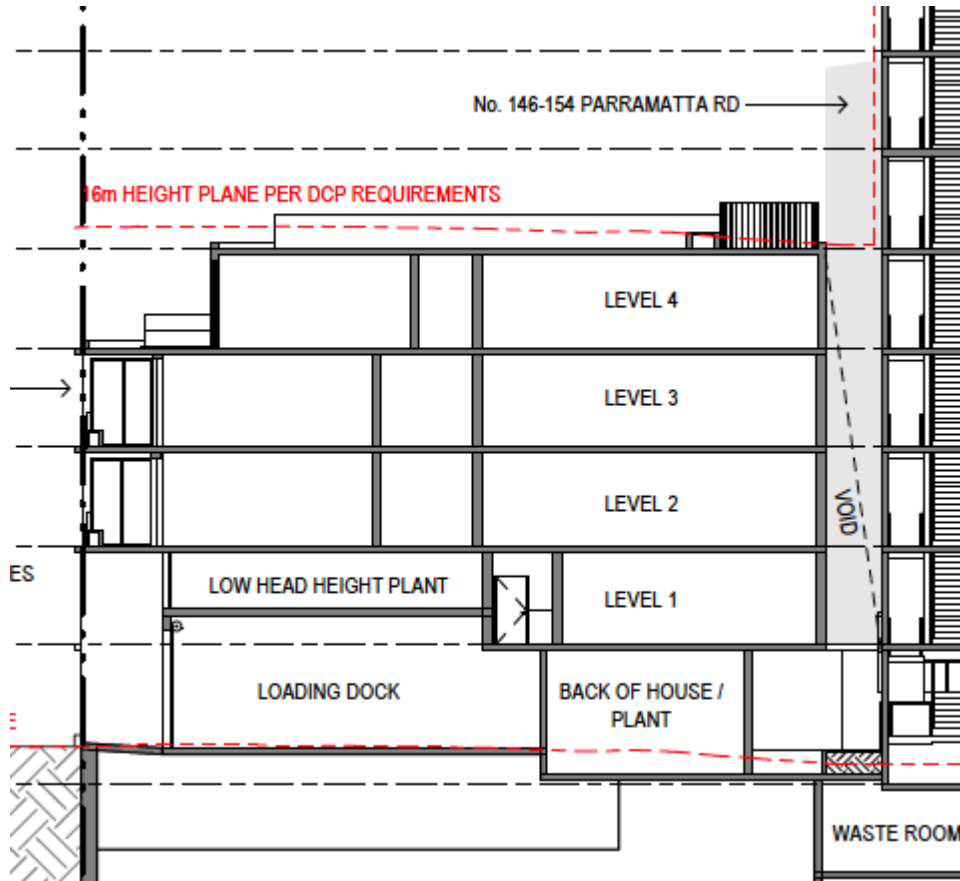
Section along the eastern elevation which shows the balustrading and plant screening which breaches the building height development control.
